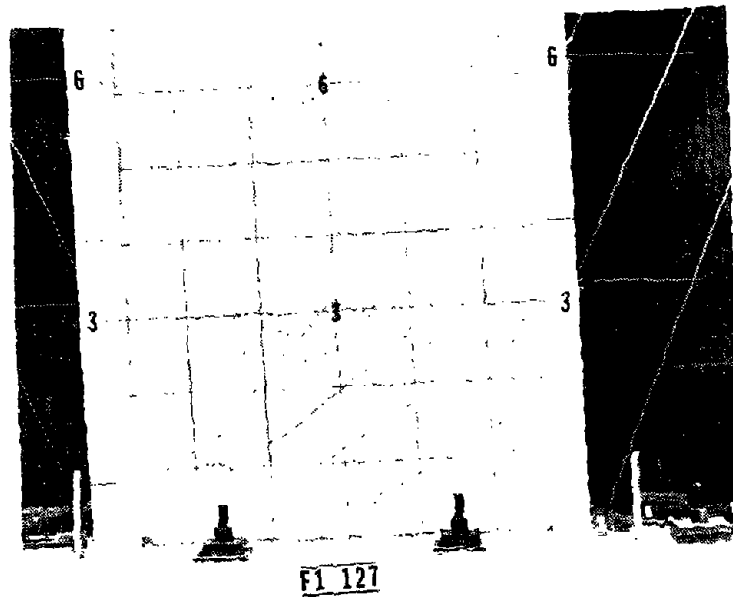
Cracking Pattern at -3 in. Deflection for Specimen F1
